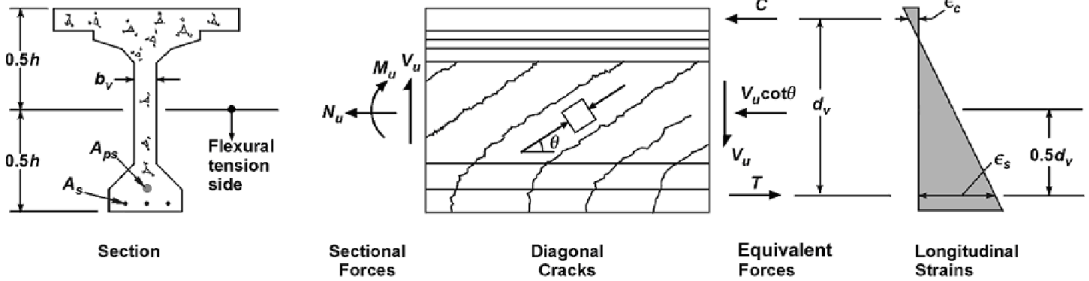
Illustration of Shear Parameters for Section Containing at Least the Minimum Amount of Transverse Reinforcement, $V_p = 0$
